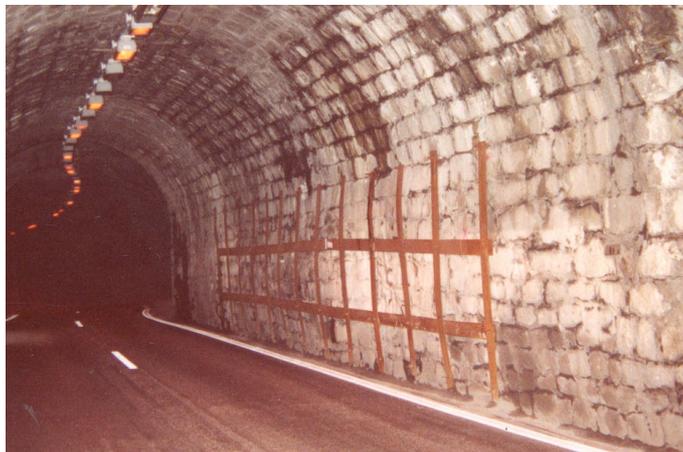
a bulging side wall, strengthened by anchors and tie rib
